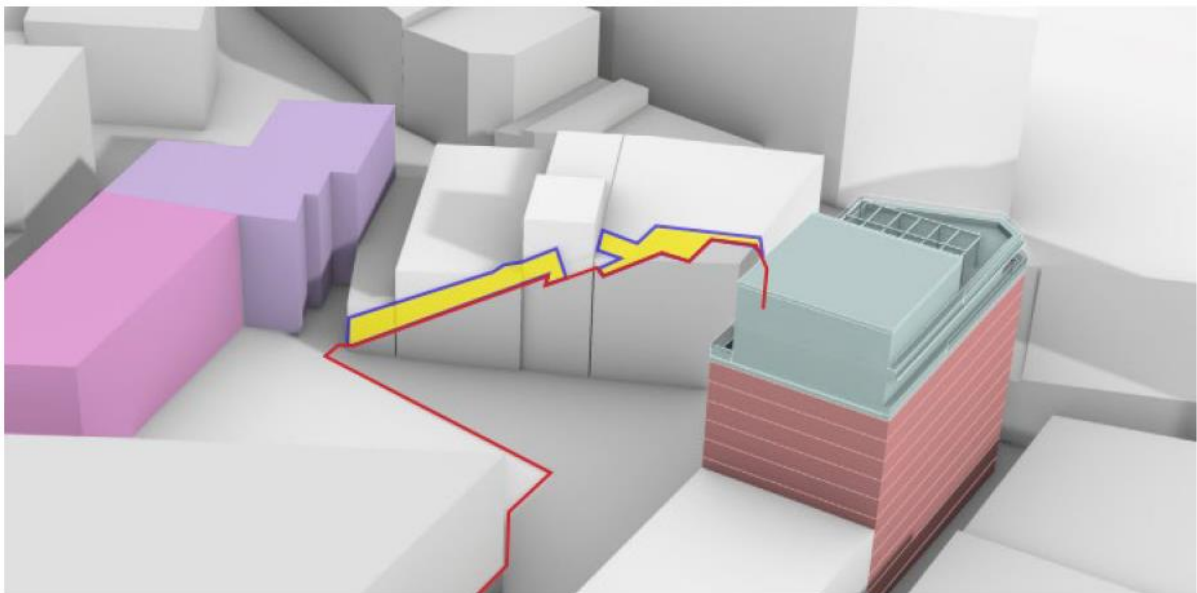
Elevations of the proposed building envelope, new additions shown in blue
